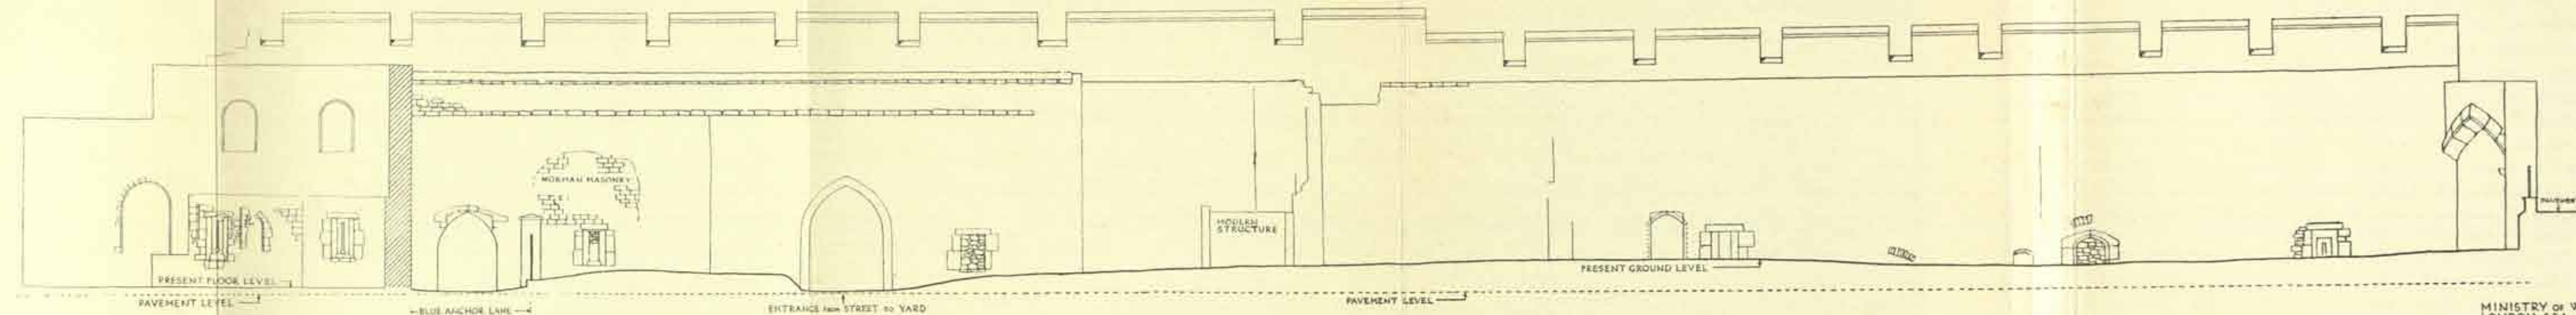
Internal elevation of the Arcade, Western Shore, Southampton
